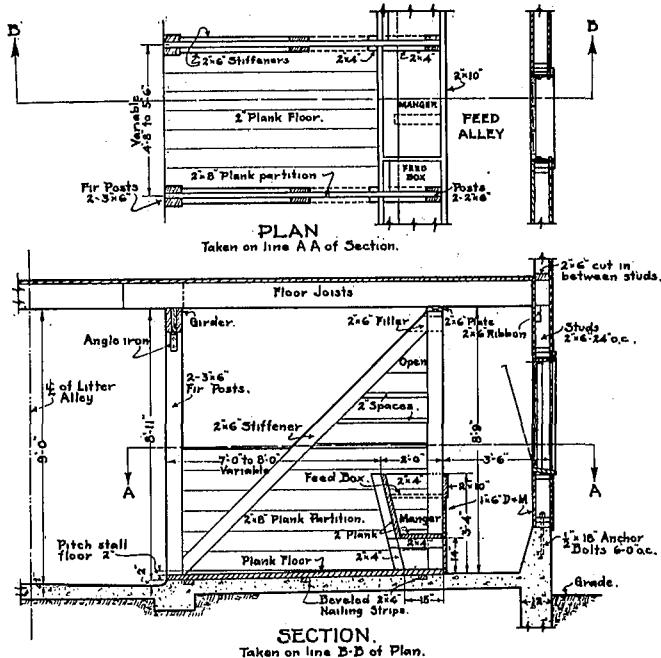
Dairy Cow Stall and Floor Section, Plan 188
